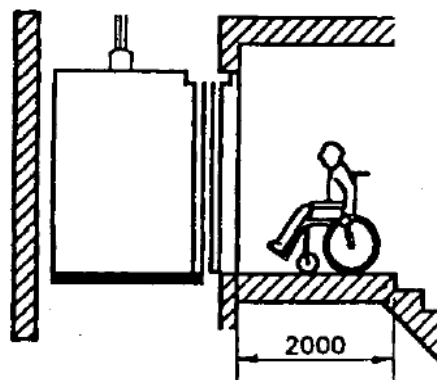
SPACE BETWEEN FRONT OF LIFT DOOR AND STAIRCASE OPPOSITE THE DOOR
